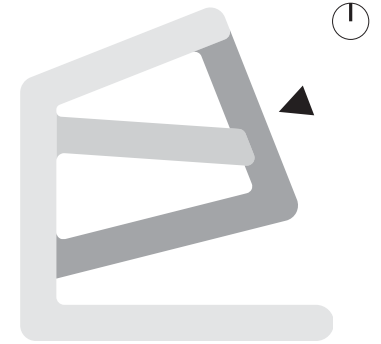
Segment of the façade on Windsor Street at scale 1:200.
